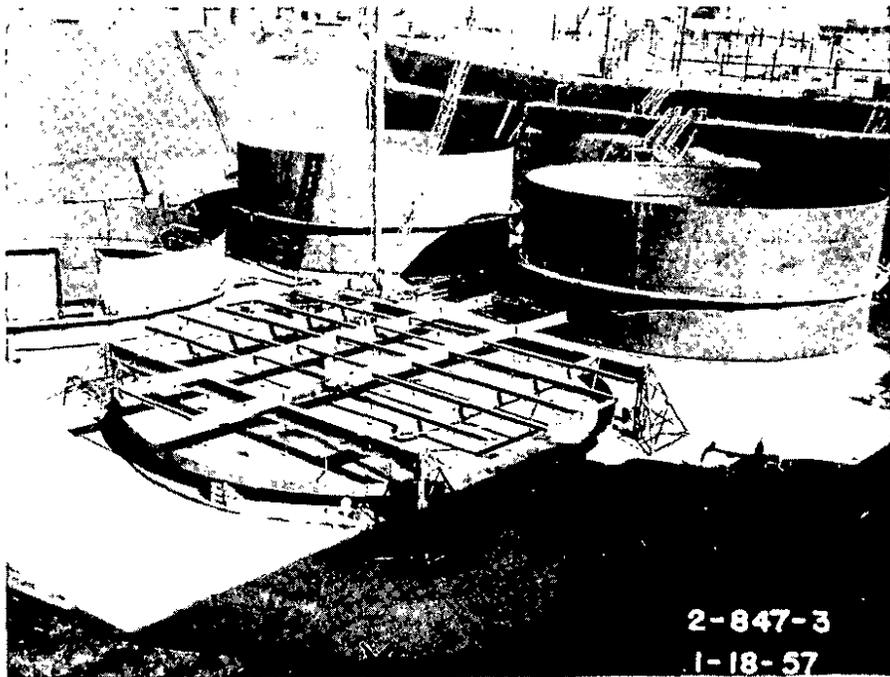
EXHIBIT VI-B ERECTION OF STEEL LINERS SHOWING RAISING-LOWERING FRAME
